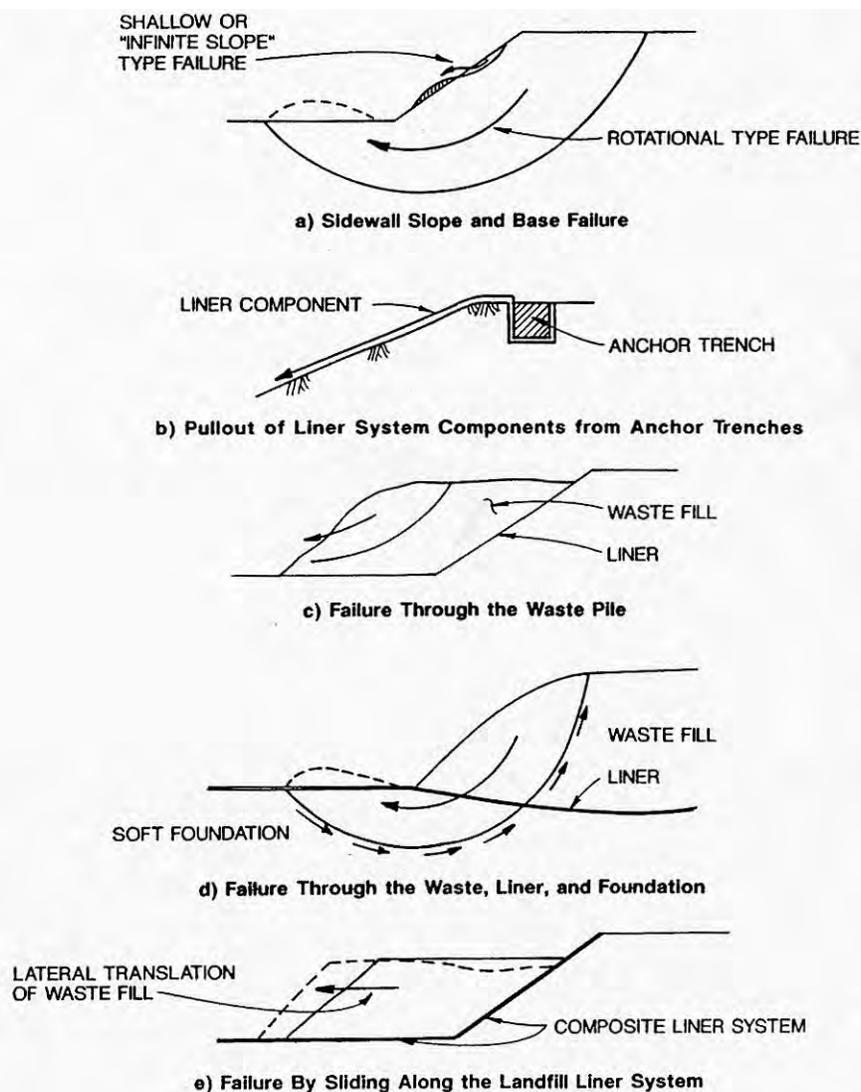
Modes of global stability failure. Upward-facing arrows in (d) show shearing resistance along the slip plane. SOURCE: Mitchell and Mitchell (1992). Reprinted with permission from the American Society of Civil Engineers.
